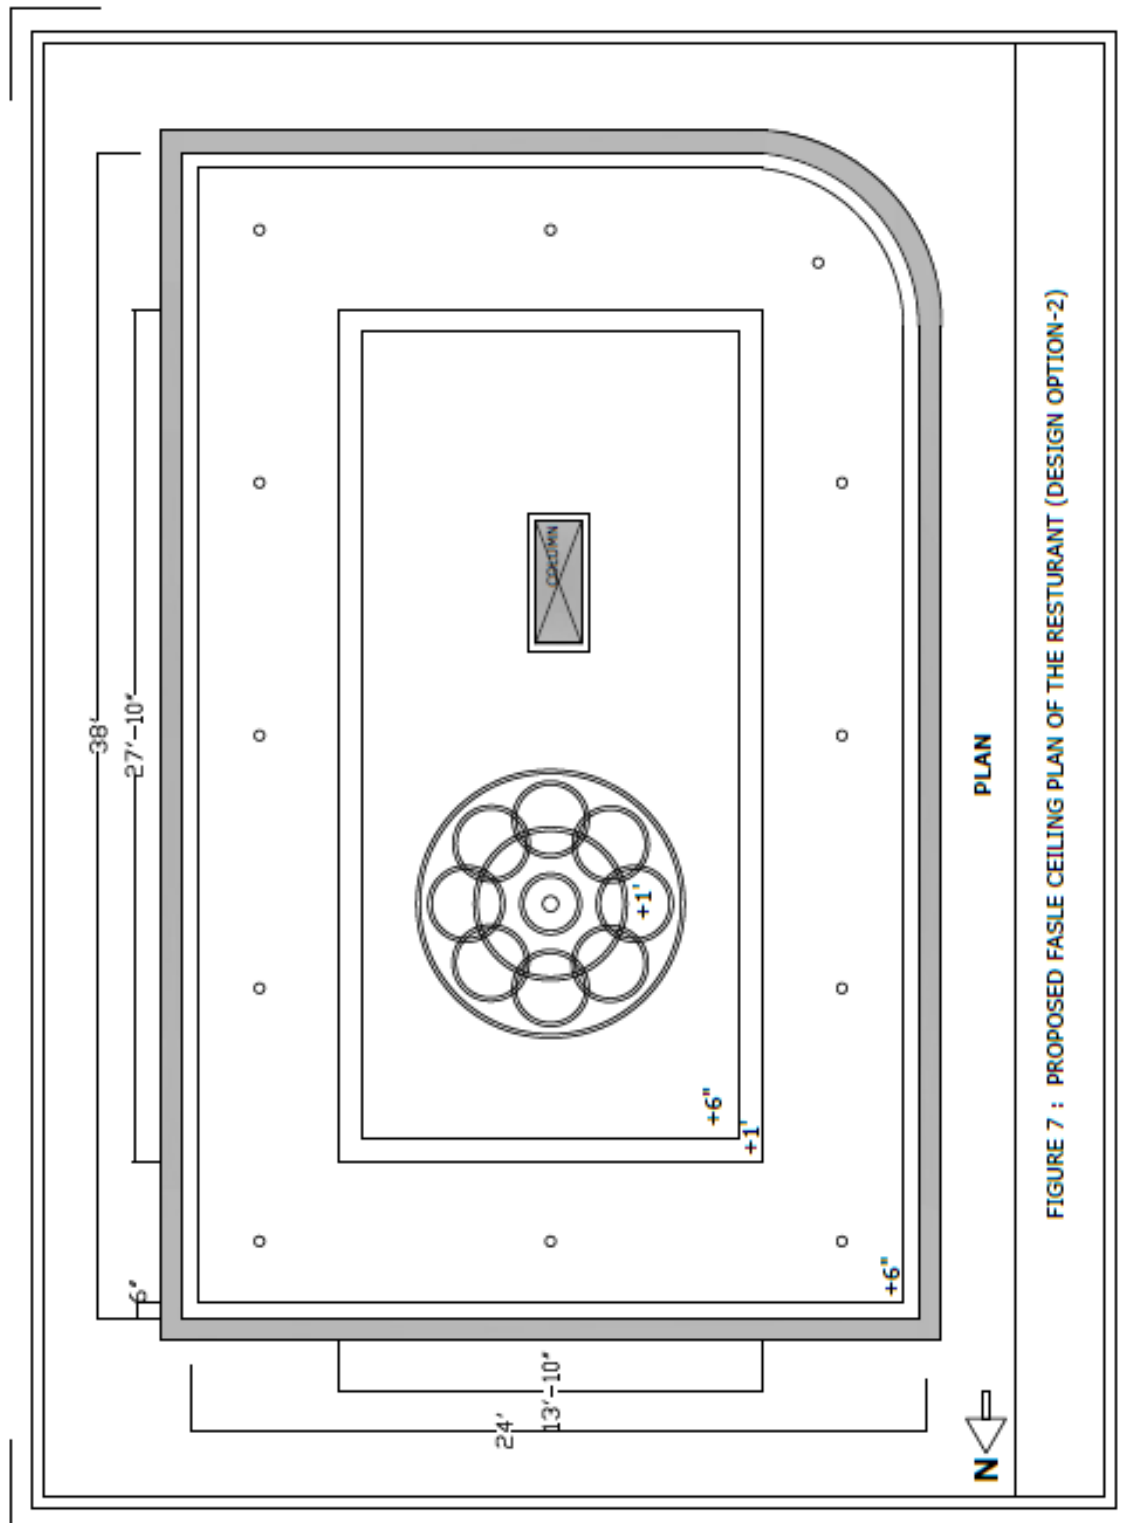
PROPOSED FASLE CEILING PLAN OF THE RESTURANT (DESIGN OPTION-2)
